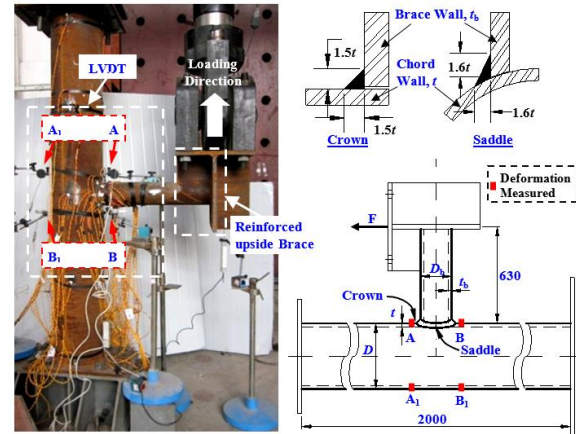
Test set-up for specimens subjected to in-plane bending (Unit: mm).
